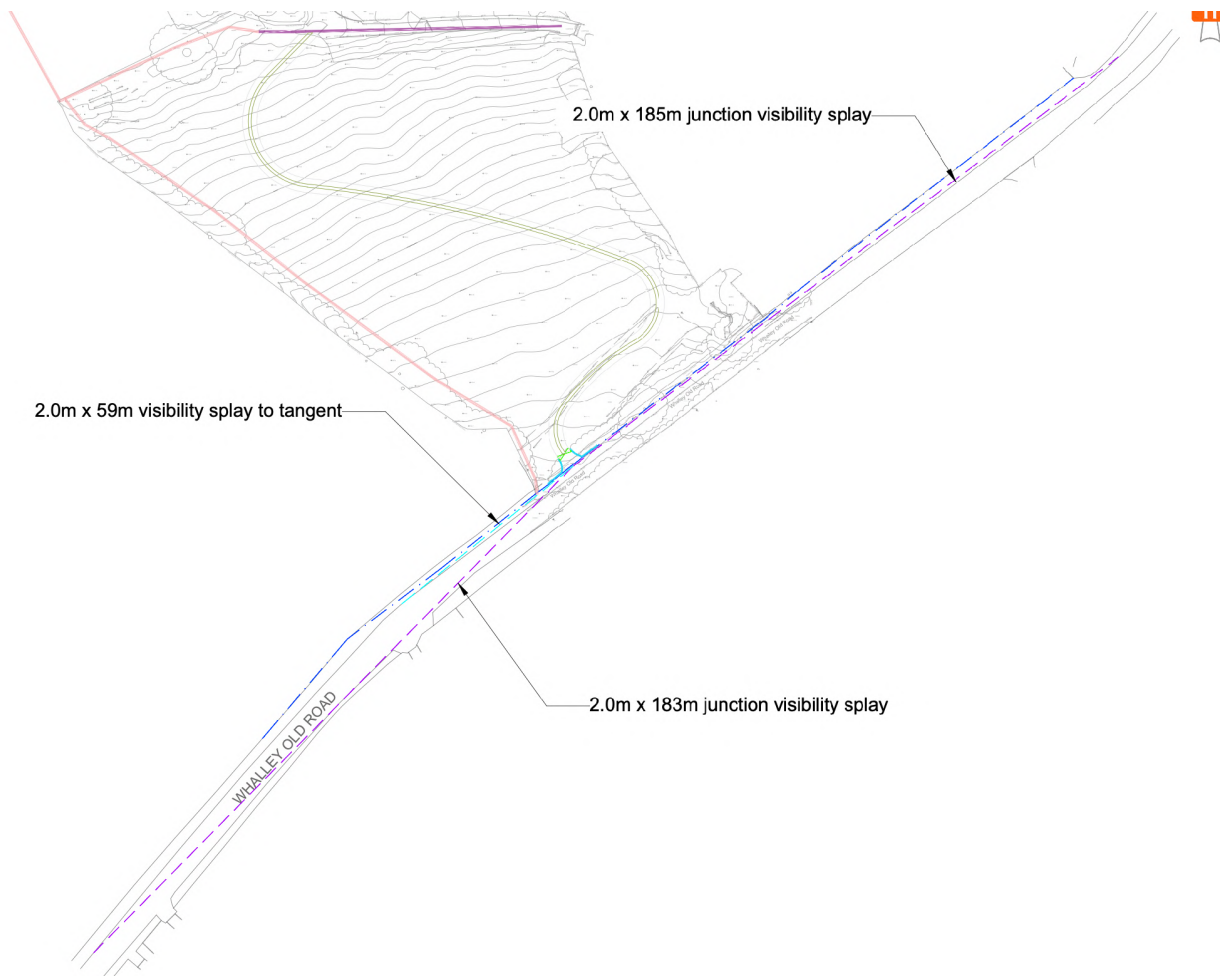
Proposed Site Access (source: Mode Infrastructure)
